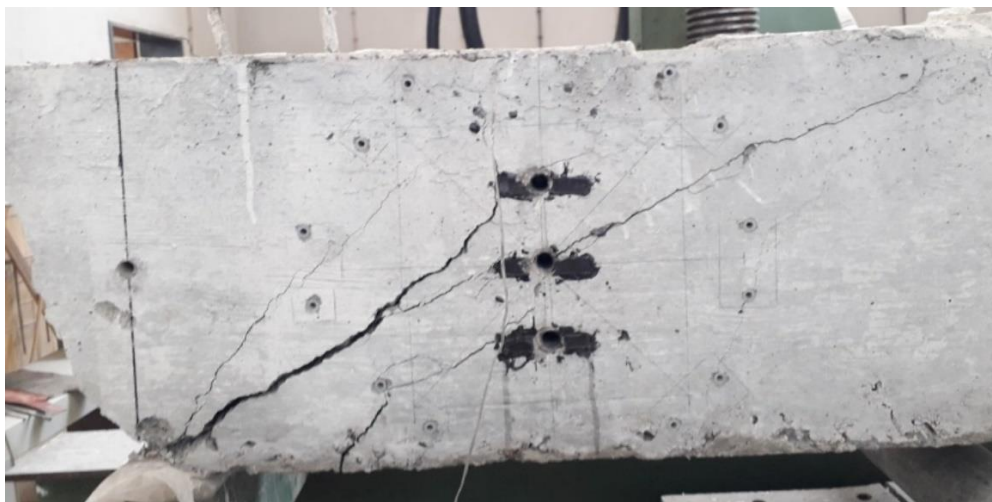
Diagonal Compression Cracks at Failure Front Side (SIII8-75)
